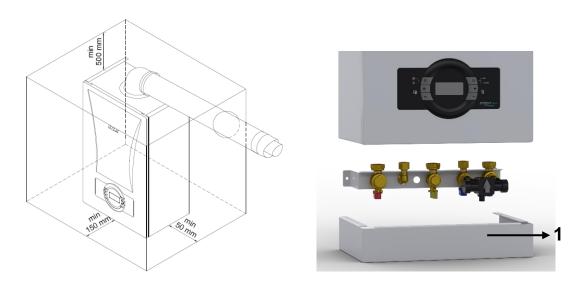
Combi Mounting Clearances Figure 11.Isolation Valve Cover Mounting
